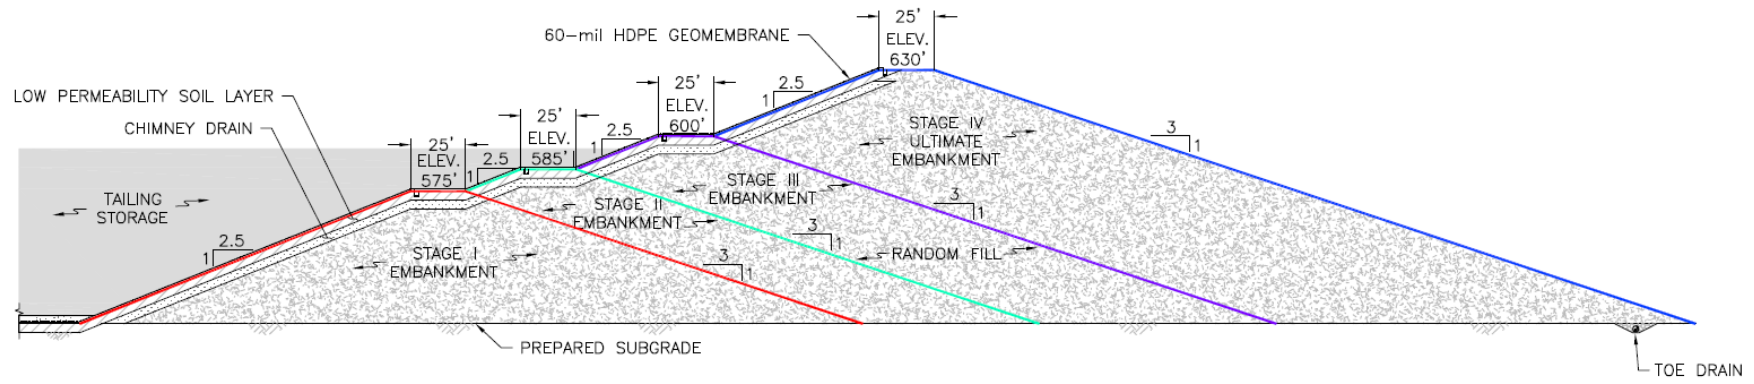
Cross Section of the Tailings Storage Facility Embankment Showing the Stages of Construction
